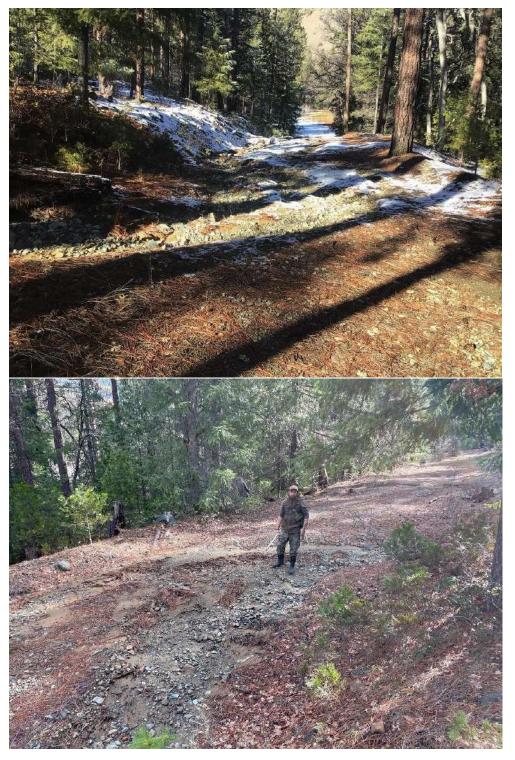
Looking upslope towards site of Figure 2.6, on a day without runoff. EFG2c. January 19, 2024.
